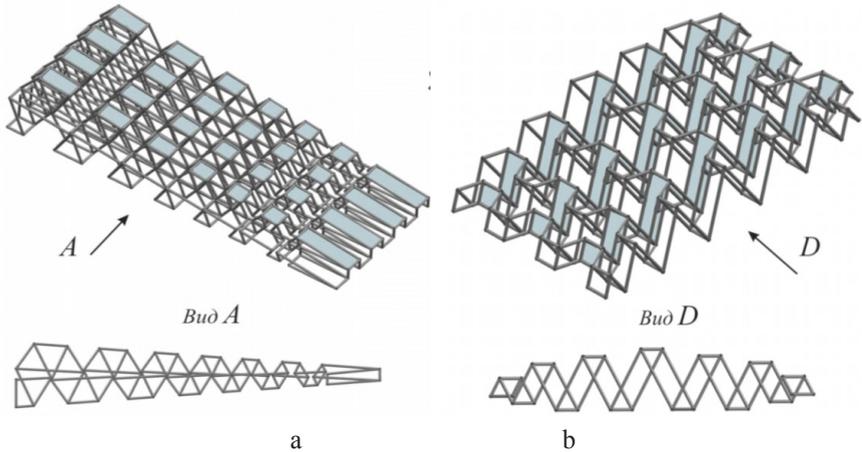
Truss structures based on reversed row folded structures with modified layout: *a* –wedge-shaped truss design; *b* – truss structure with ogive envelope
